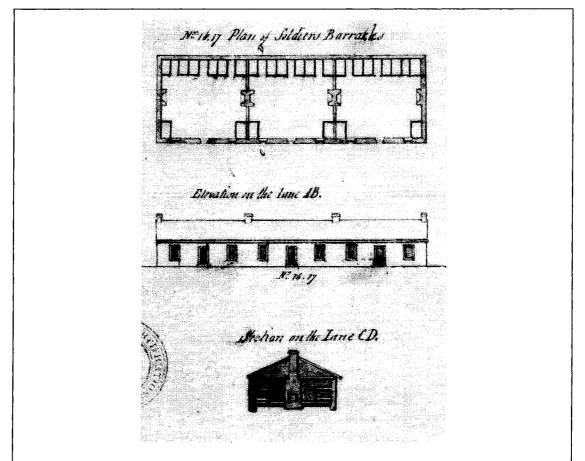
Portion of Lt. Col. Durnford's 1823 plan and elevation depicting one of the brick Soldier's Barracks (NAC, NMC-5352).
